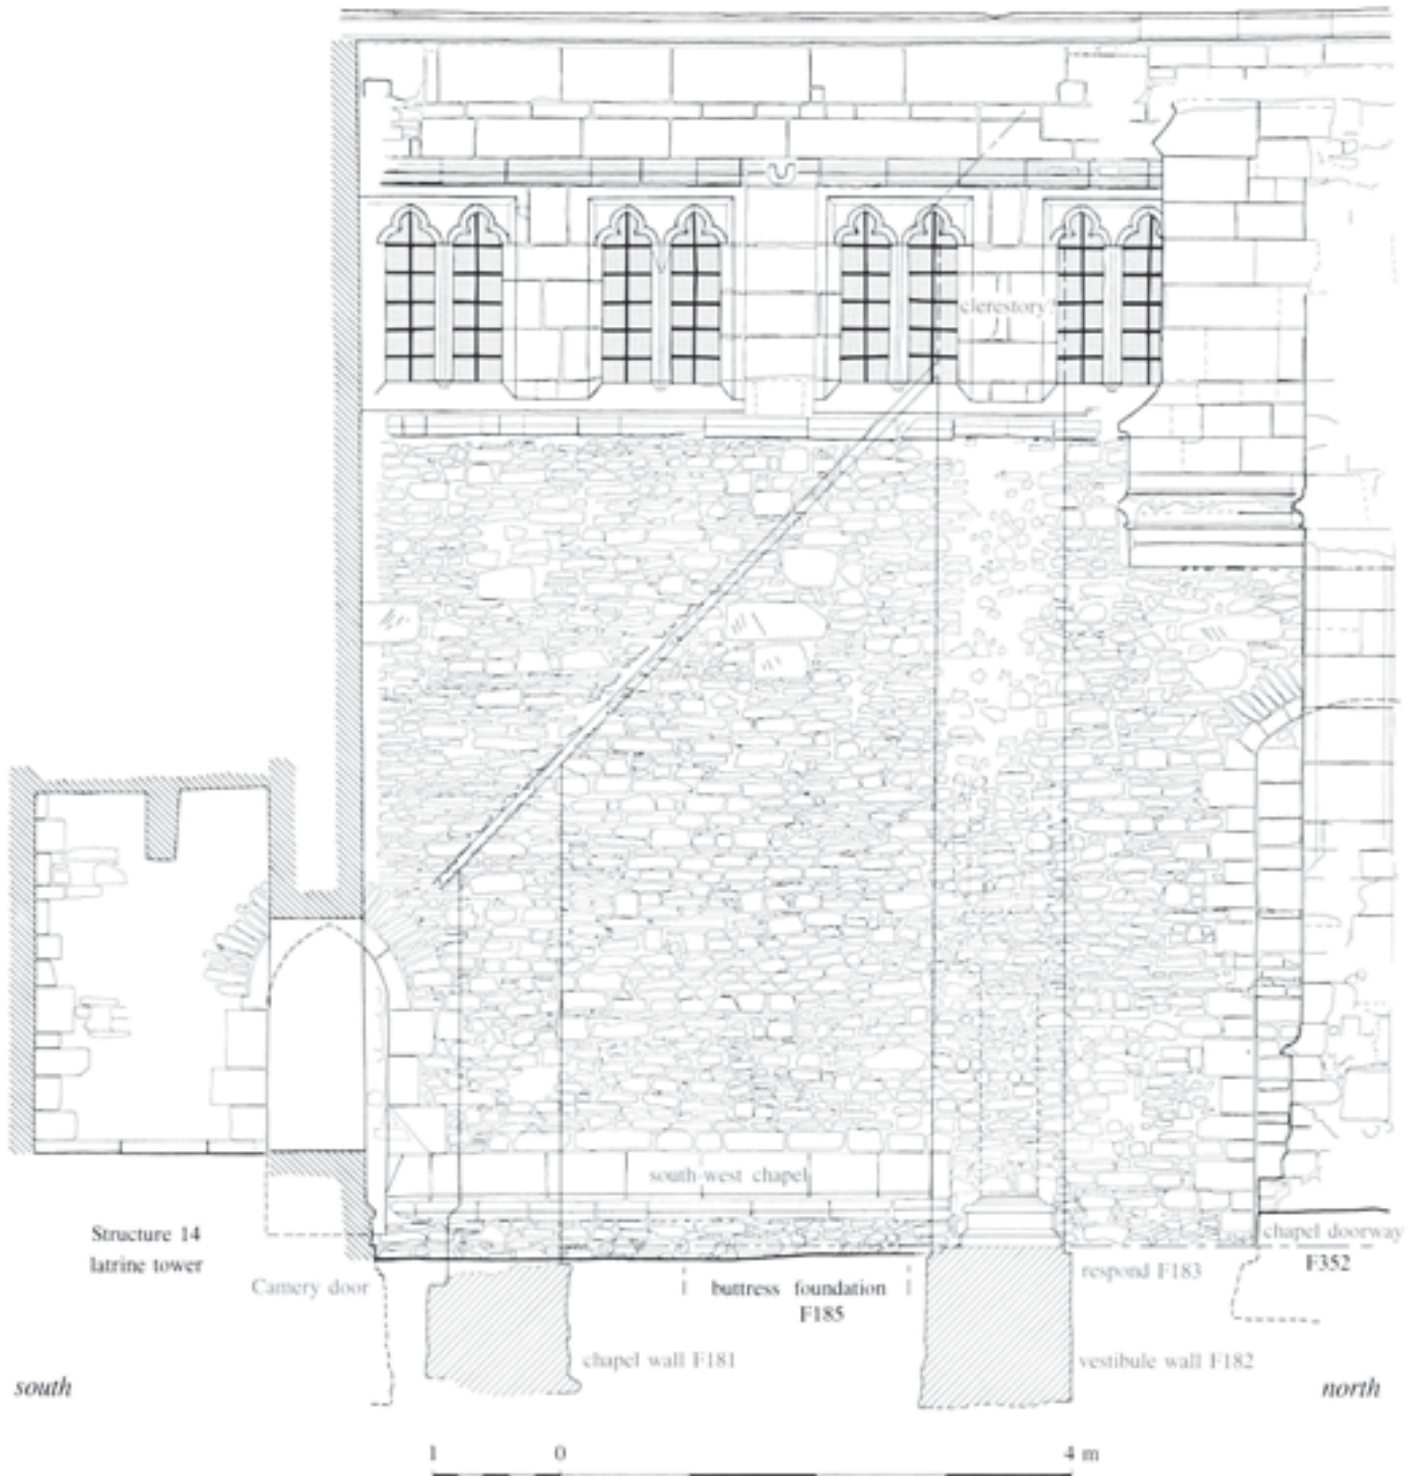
Detailed elevation of bay E₄ of the east cloister, showing a reconstruction of the successive abutments of the nave and south aisle of the Lady Chapel, respectively. The elevation is based on photogrammetry and rectified photography. Scale 1:60
